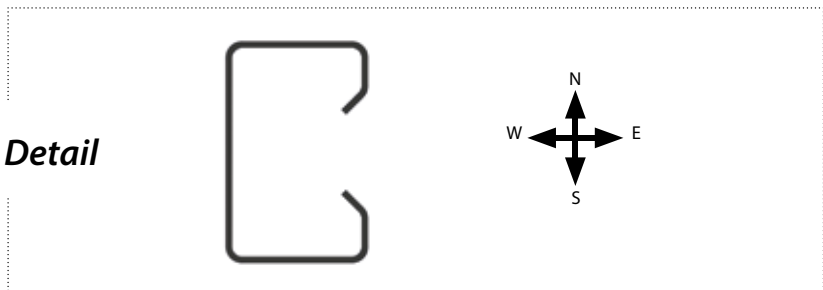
4. (detailed view of the foundation post - from above)
